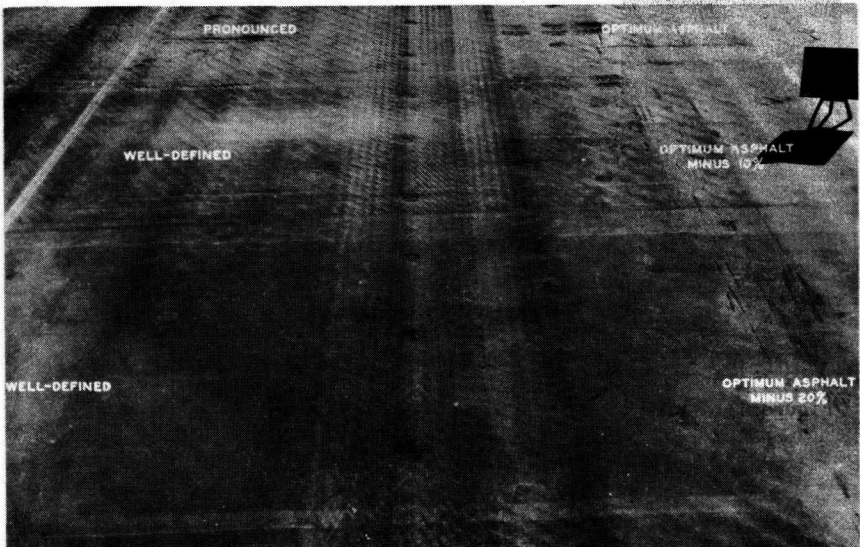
View Showing Typical Rutting, Section 3C-1, Mix 7, 122 Coverages, 37,000-lb. Lane
